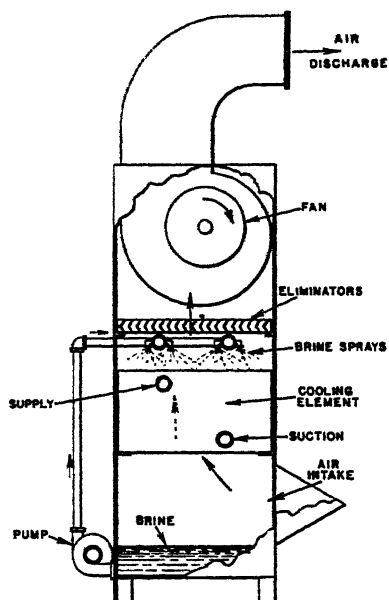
BRINE SPRAY TYPE COOLING UNIT
